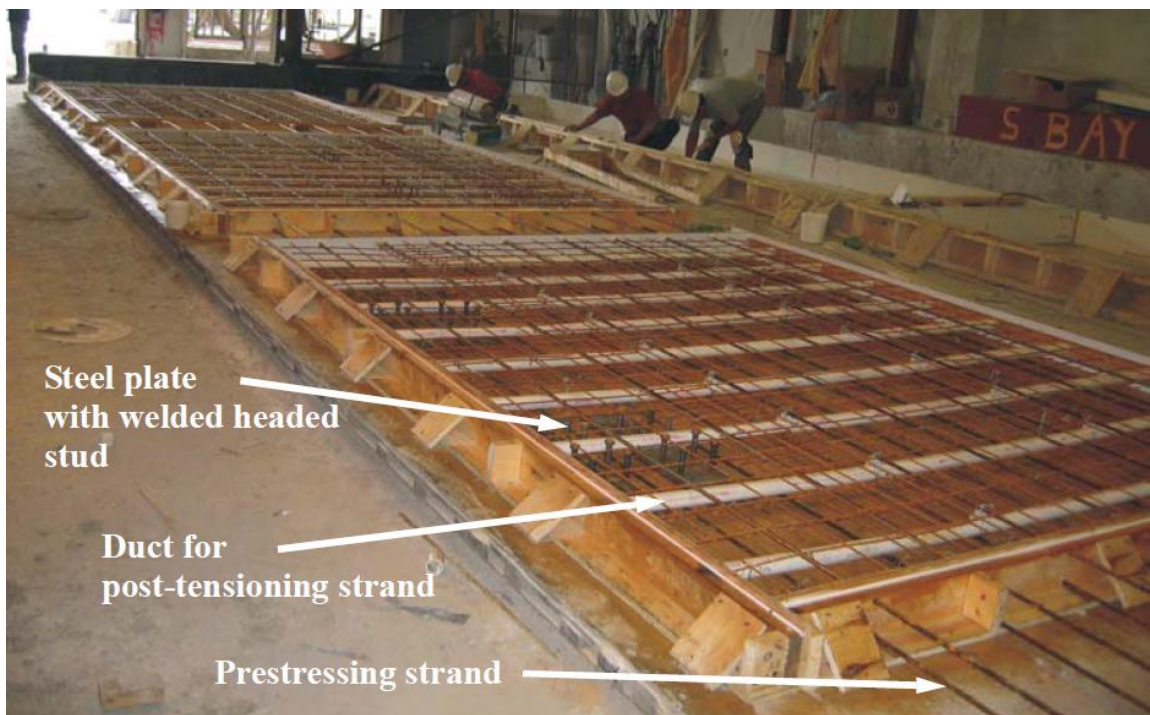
Precast concrete deck panels before casting concrete (Kim and Sause, 2005)
